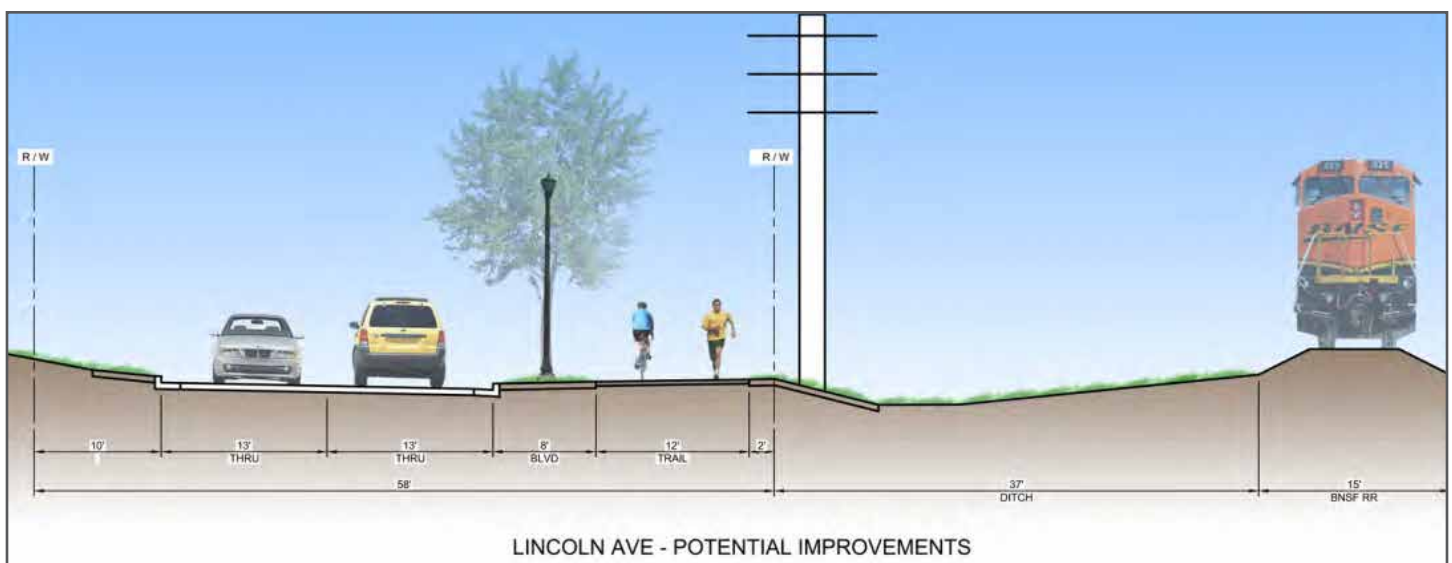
Section Illustrating the Bruce Vento Trail within the Lincoln Ave ROW Between Whitaker Street and Highway 96
